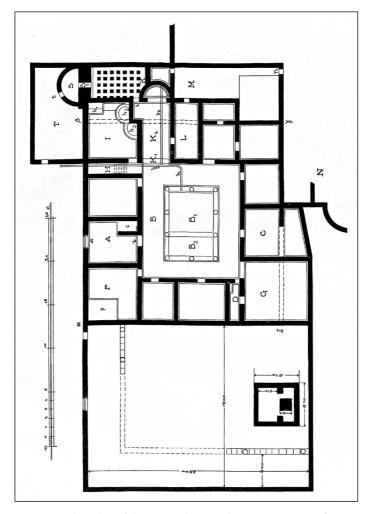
Doclea, plan of the private house (after STICOTTI 1913, fig. 37).
